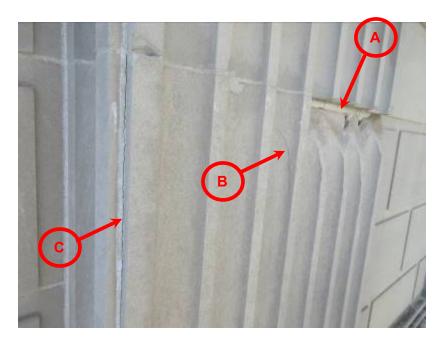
(A) Previously removed spall and (B) new cracks in stone unit on Drop #18b. Note (C) separation in mortar joint.
